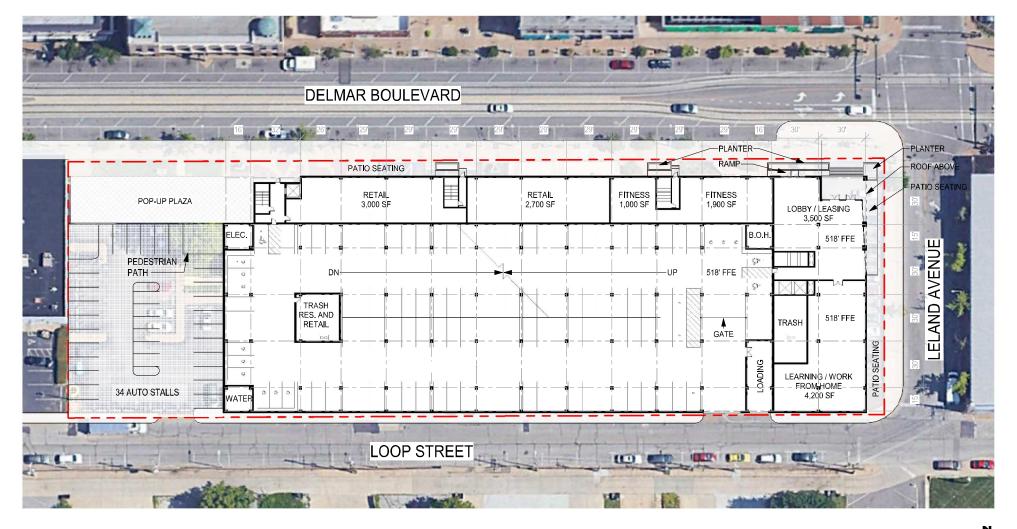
EXHIBIT D (ARCHITECTURAL SITE PLAN)
